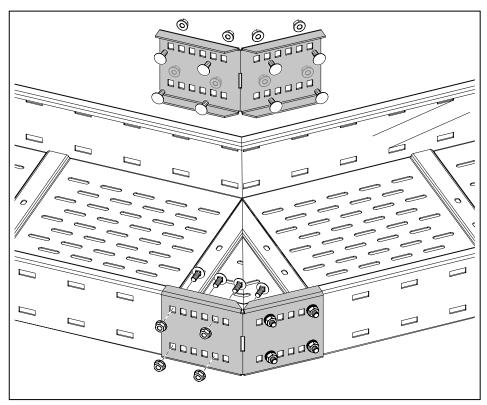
Screwing on the WRWVK angle connector to the inner and outer angle
